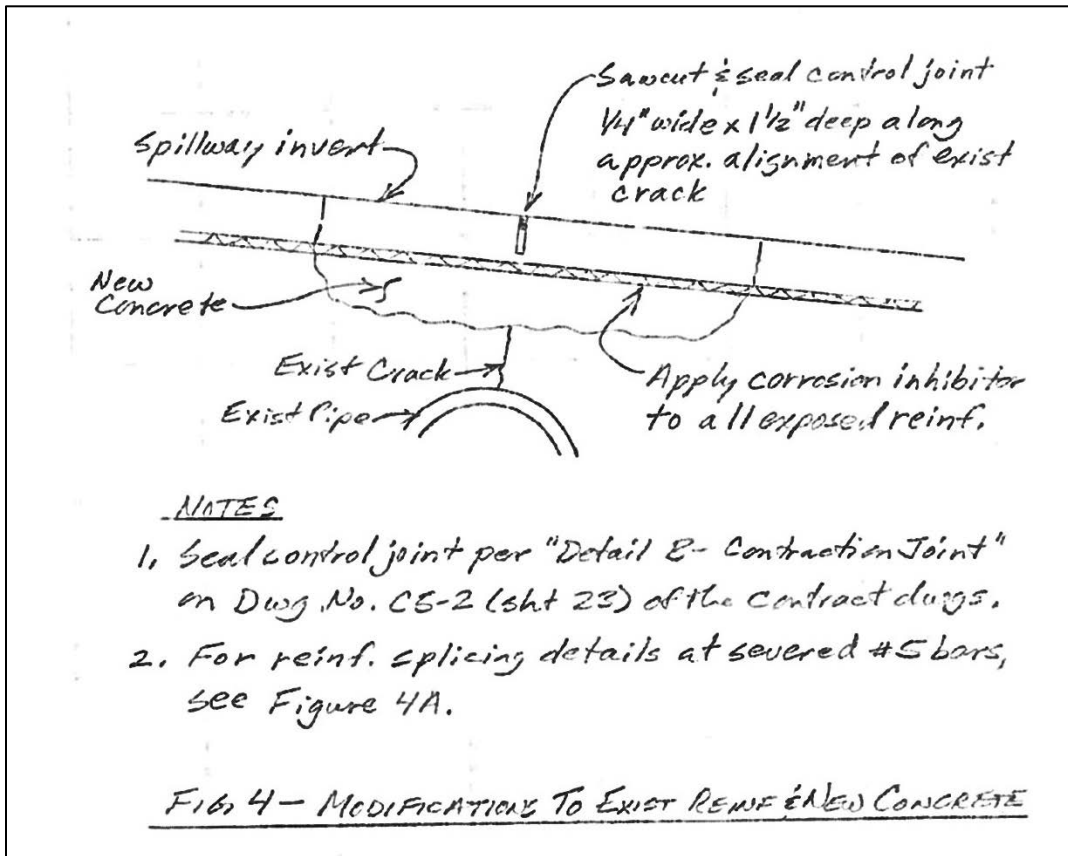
Revision to 2009 Repairs to Provide Sawcuts Above Cracks Over Drains
